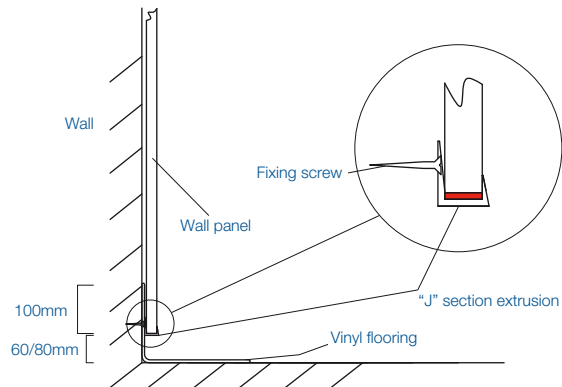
'J' section panel finishing trim – used in conjunction with vinyl floor
